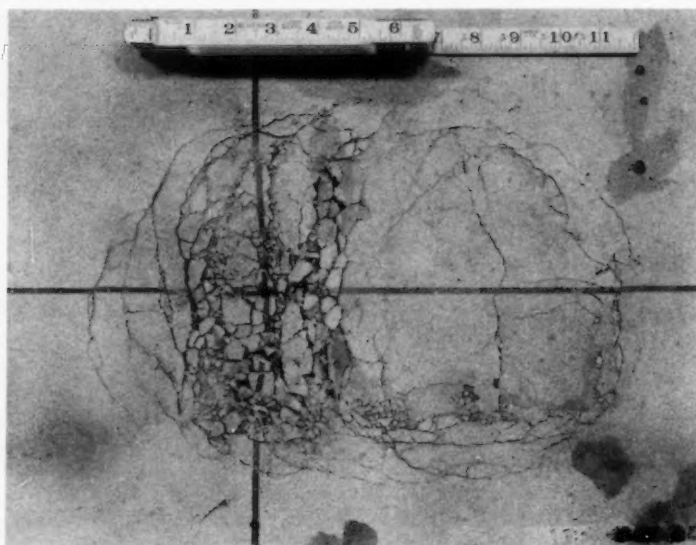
FAILURE OF 1-IN. THICK PRESTRESSED MODEL SLAB
